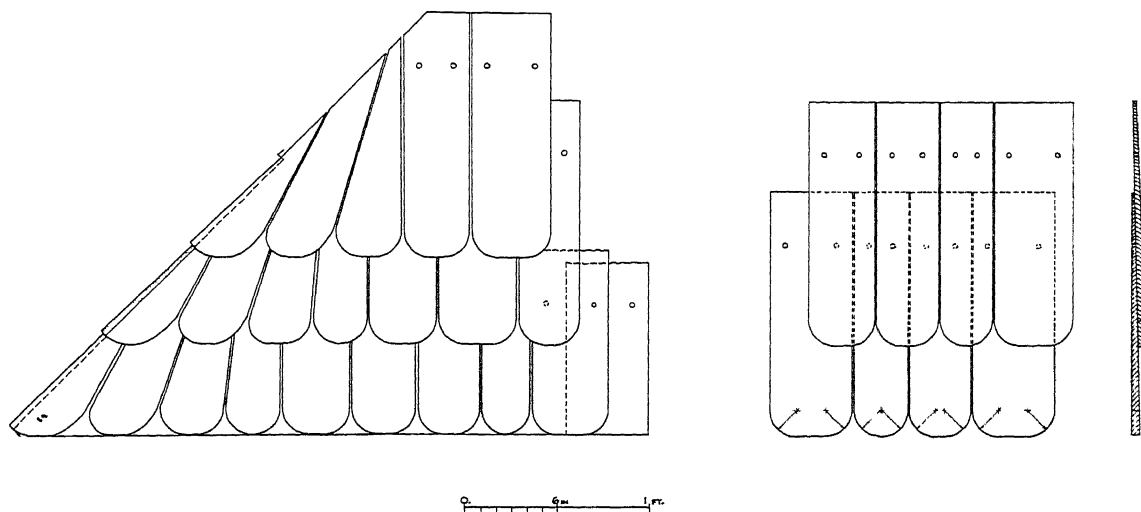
DETAILS OF SHINGLED ROOF, SHOWING FAN-TAILING AT HIP (LEFT)
